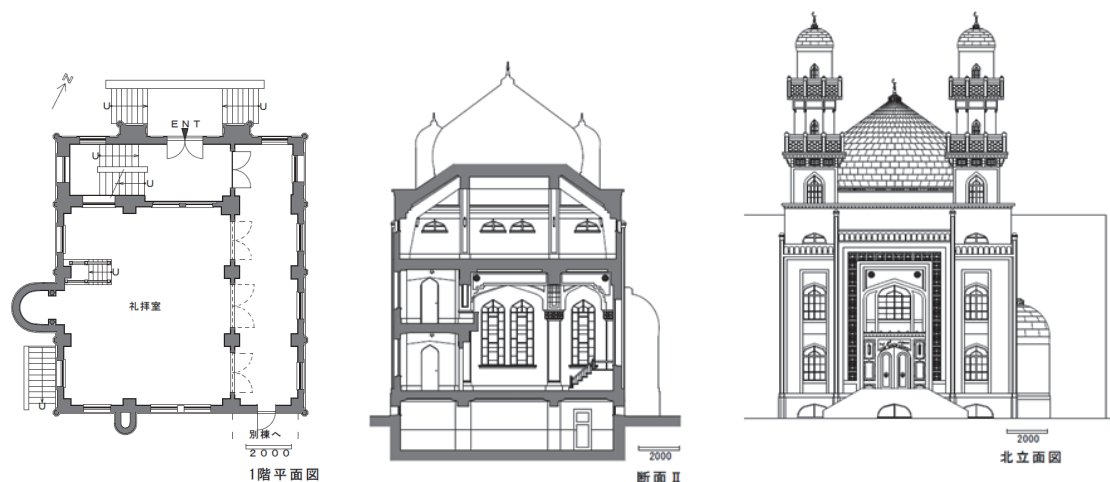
Plan (G/F), Cross Section and Front Elevation (2012)
